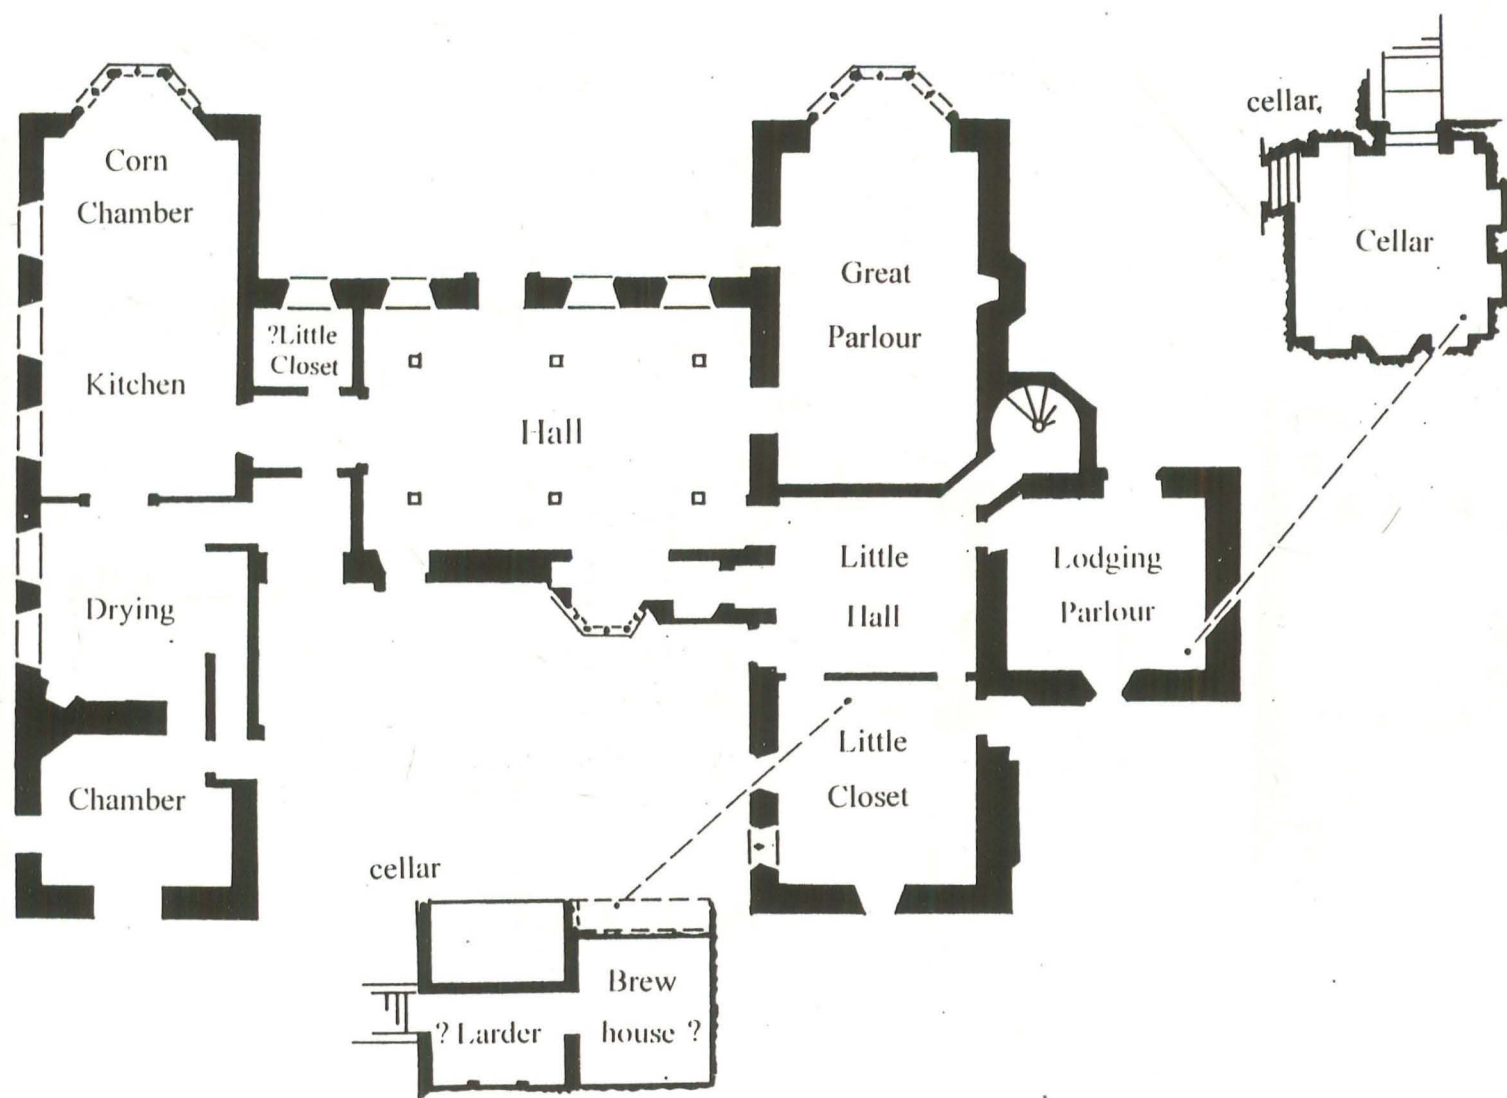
Suggested lay-out of ground floor rooms in 1630,
